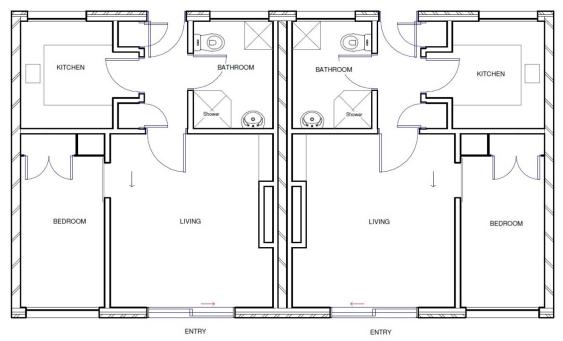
Floor plan of residential units 1-25 at Weaver Courts Housing Complex.
